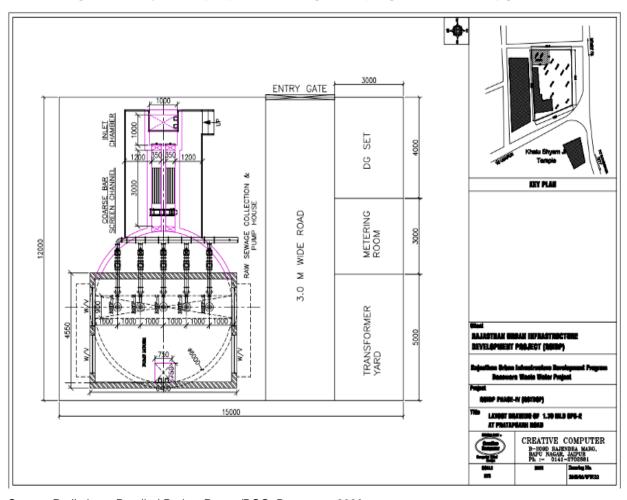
Layout of proposed Sewage Pumping Station, Pratapgarh Road
